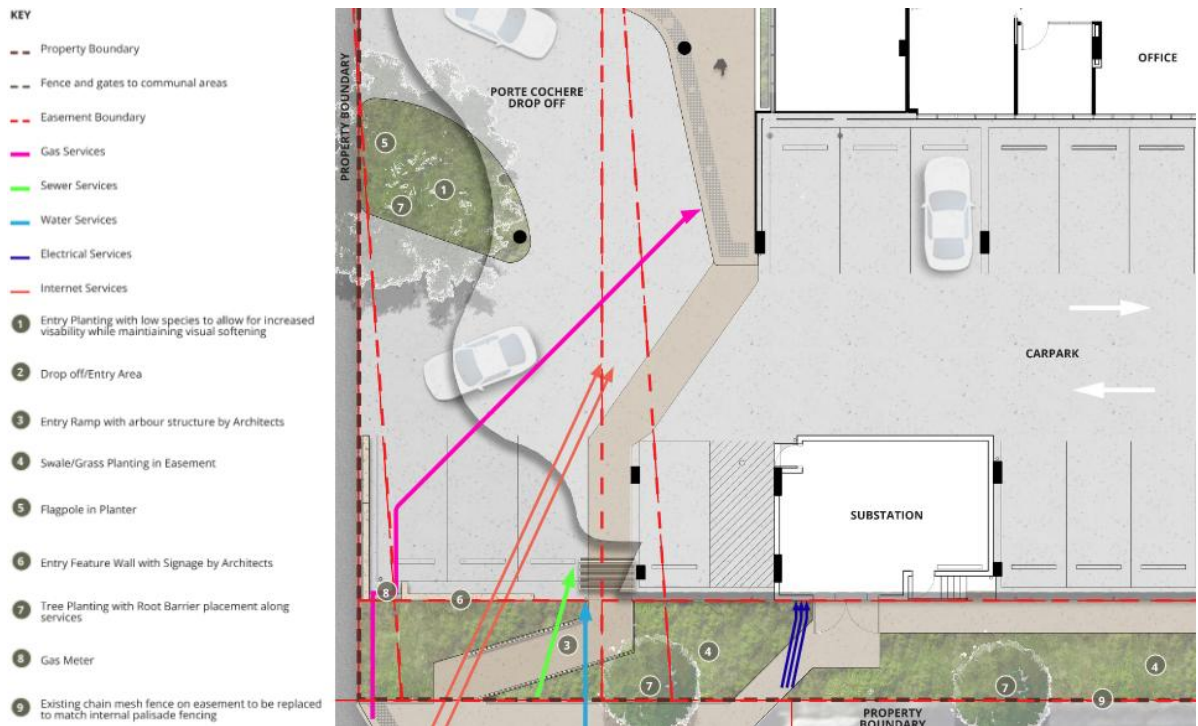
Proposed Landscaping Plan – Ground Floor (Detailed Plan 2) (Source: Arcadia)
